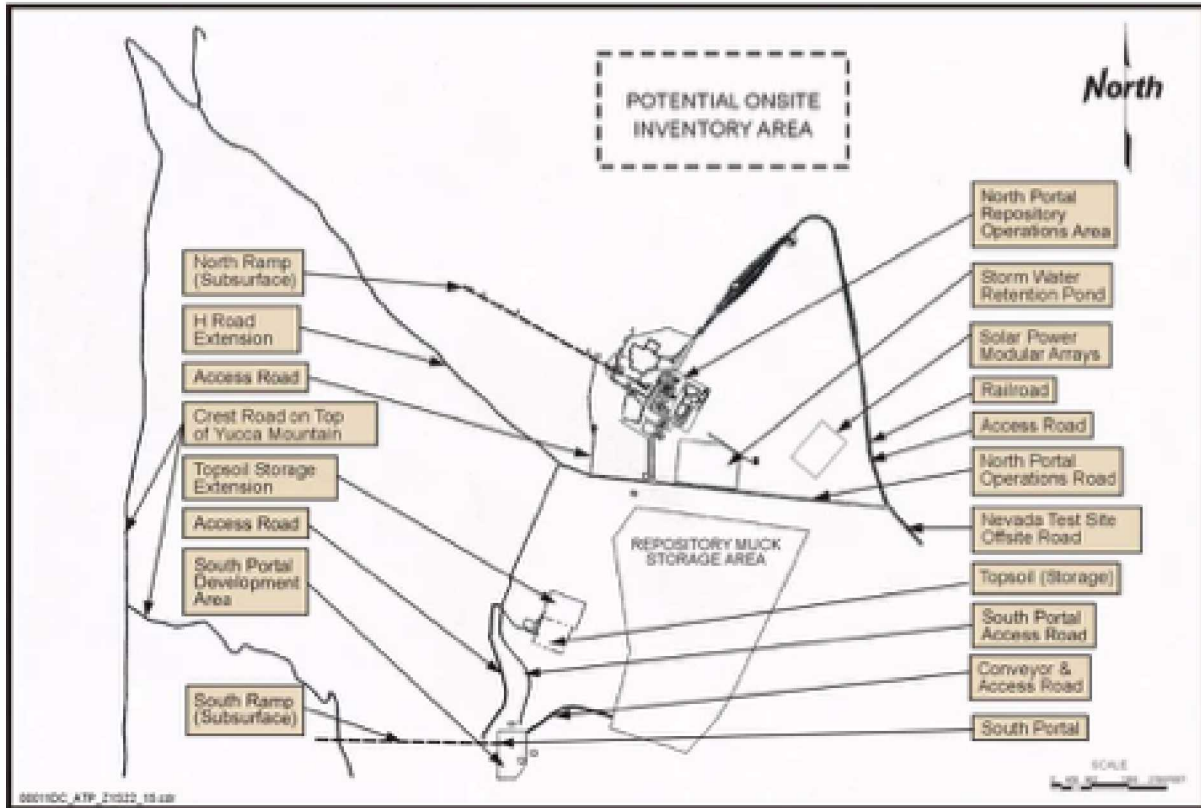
Plan view of proposed surface facilities at the Yucca Mountain site. Surface facilities would be developed to support operations and construction activities at portals for the North and South ramps. Roadways would link the two ramp portals. Source: Figure 2-16: of [19].
